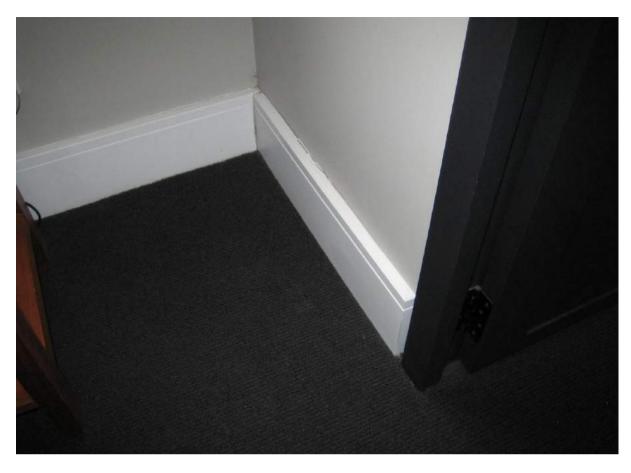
Water damage on the southern return wall in bedroom 1 in Unit 301.
